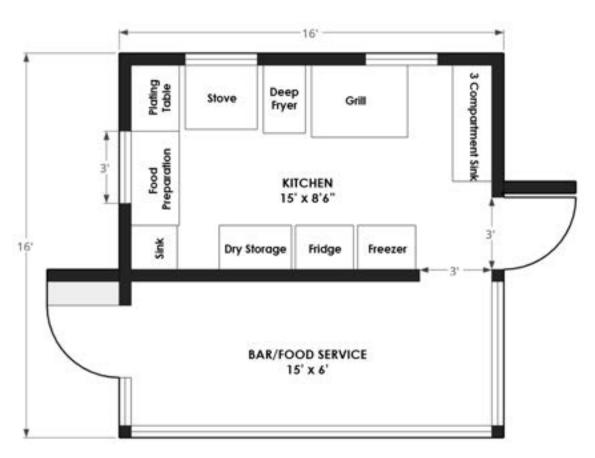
Medium Unit – Detailed floor plan sample Note: Units will be rented as a shell and outfitted on the interior as desired by the lessee.
